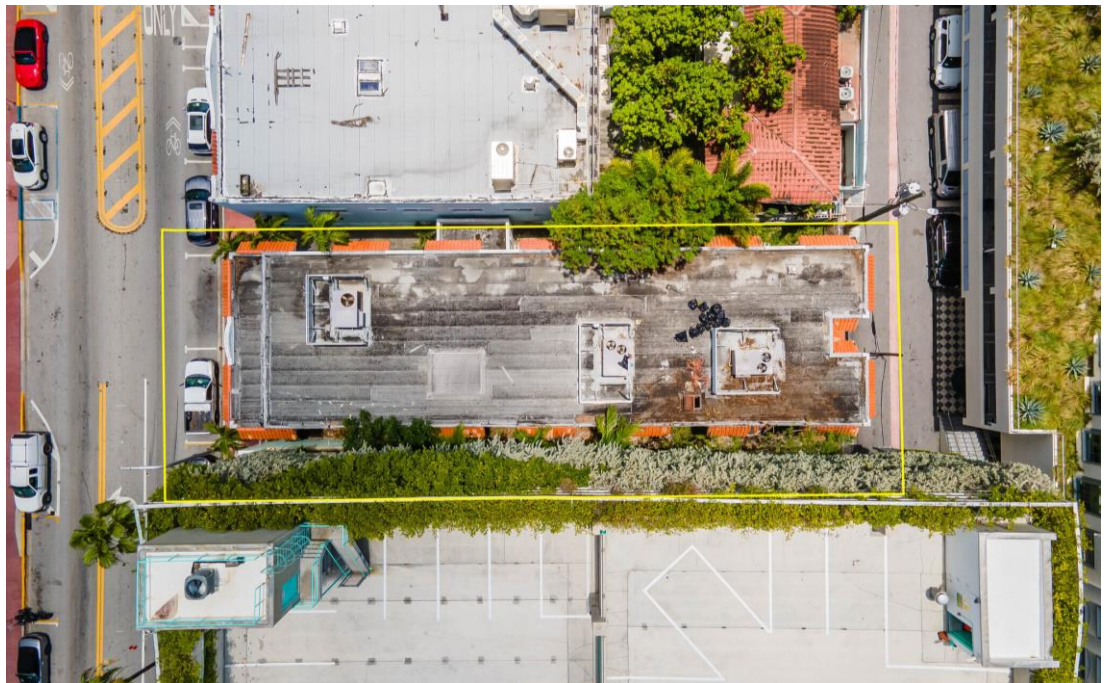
EXHIBIT (J): AERIAL VIEW OF THE BUILDING / PHOTO TAKEN: 2023
